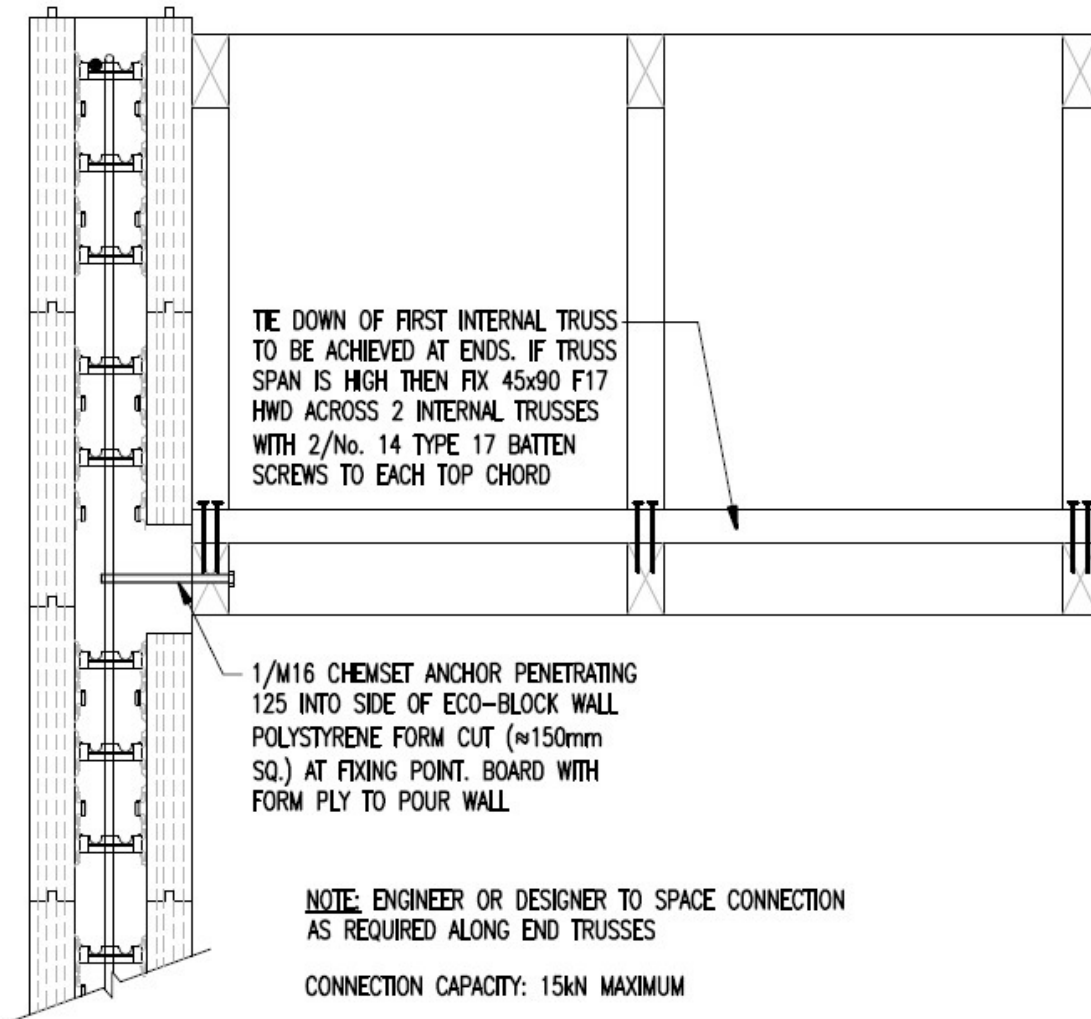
Gable End Roof with ECO-Block Wall Parapet
